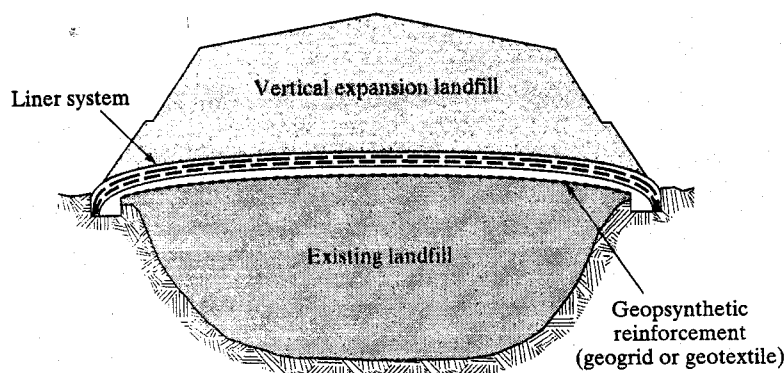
Cross Section of a Piggyback Vertical Expansion Landfill
